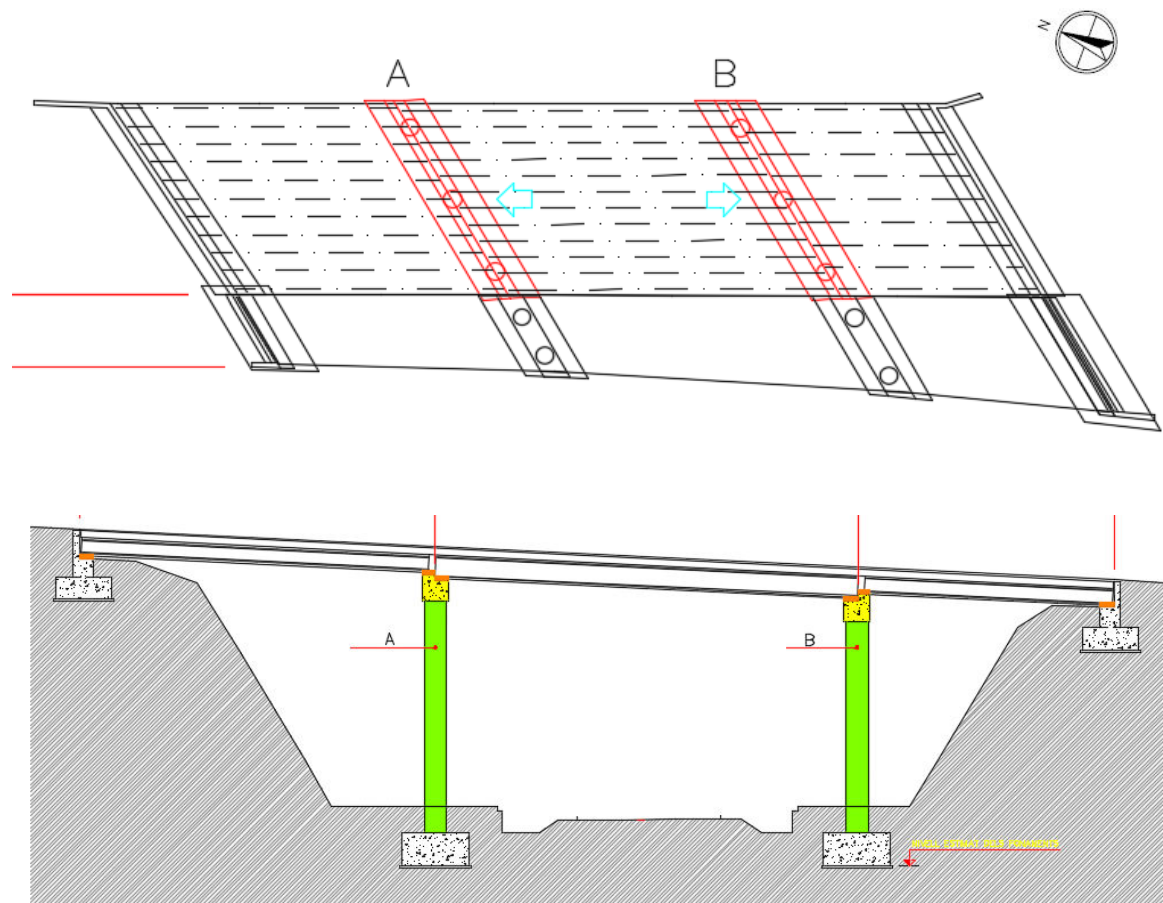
Plan and elevation of the bridge are showing the porticos analyzed
